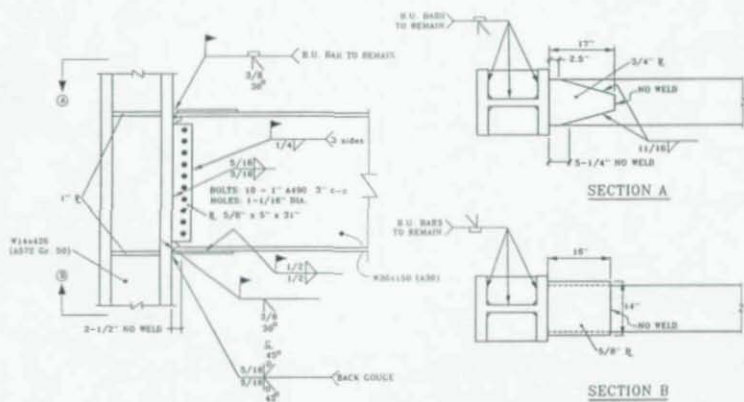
SPECIMEN 8 CONNECTION DETAIL
